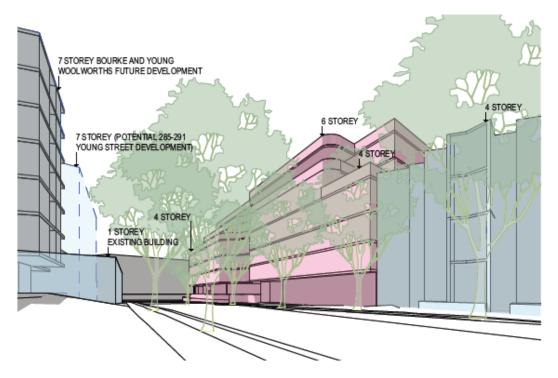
Indicative development concept – view looking south from Young Street Source: Plus Architecture Urban Design Report
